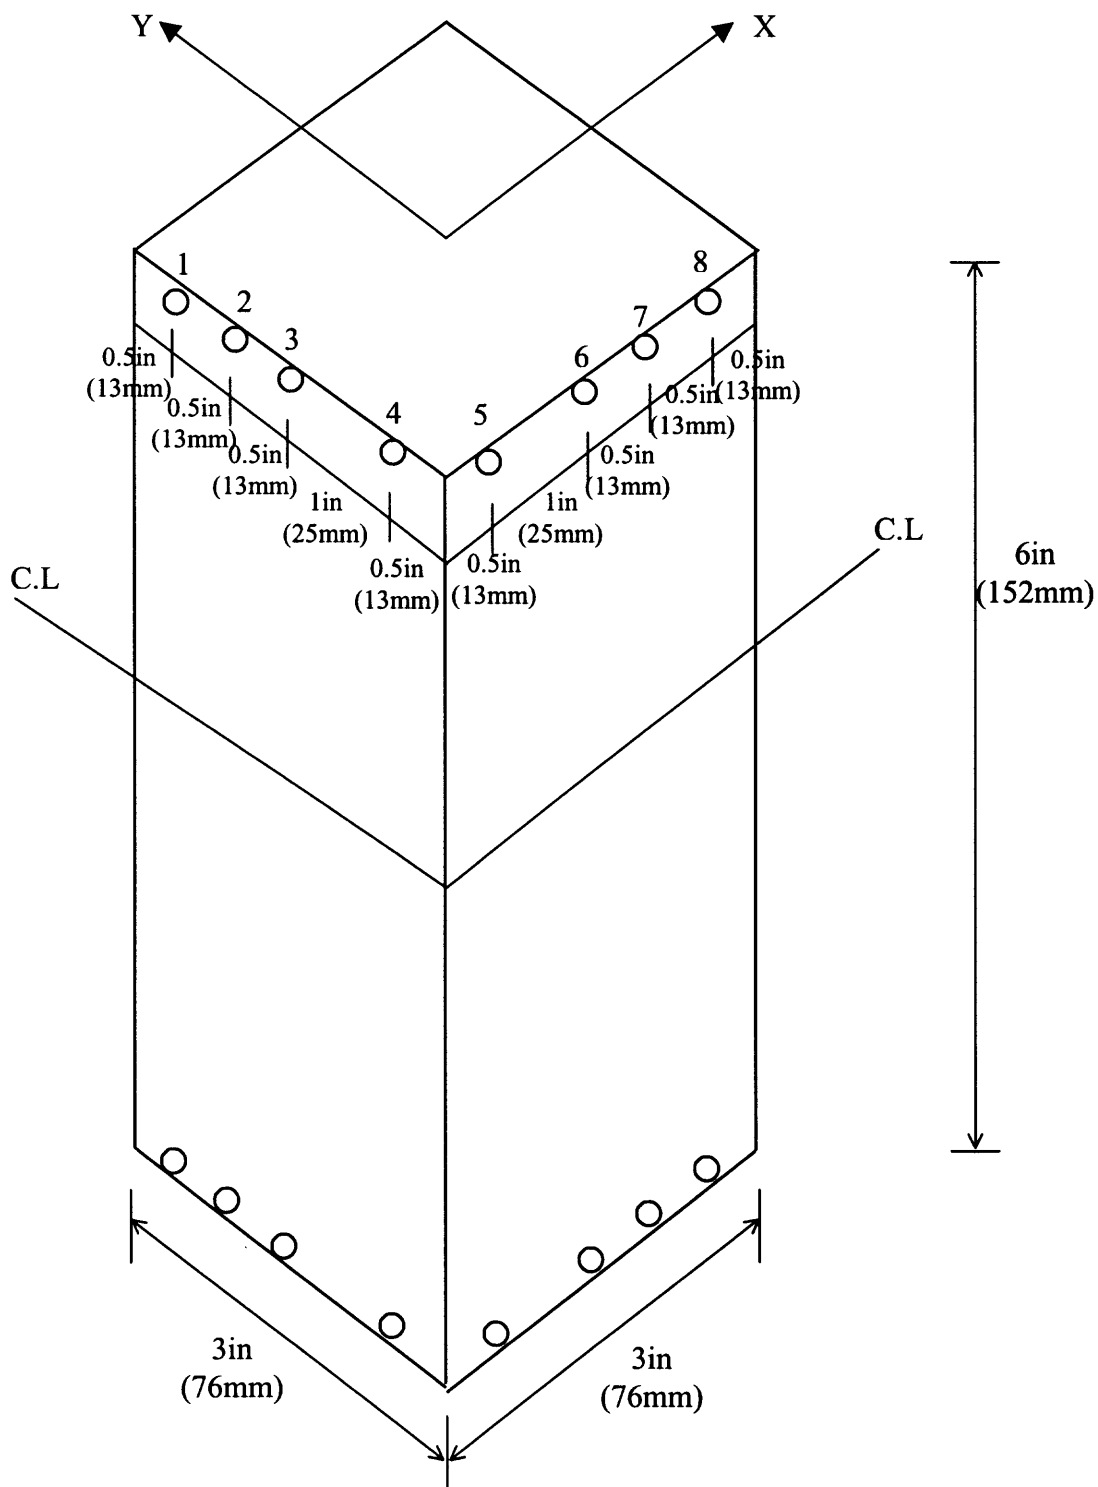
Arrangement of mechanical strain gages over column segment.
